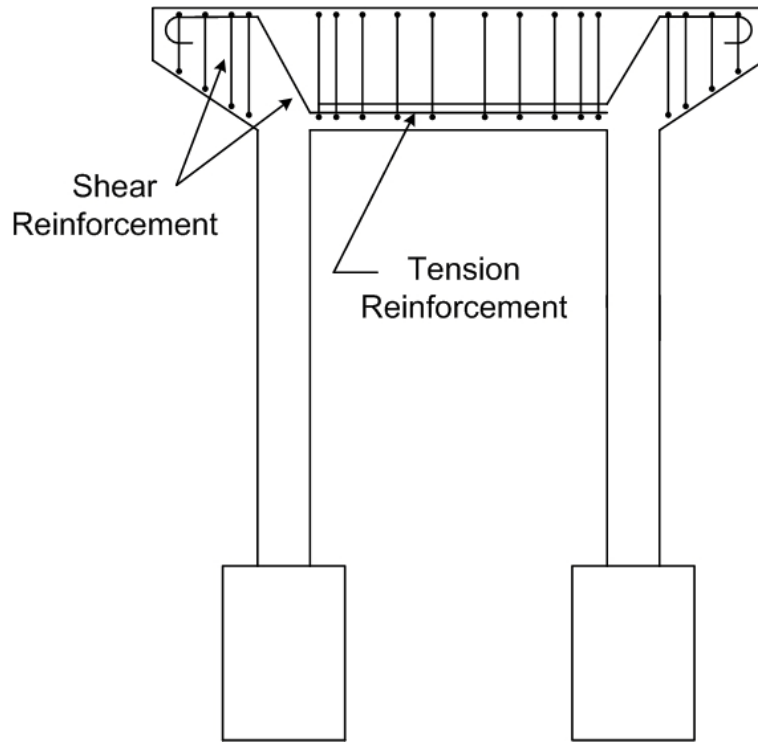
Spandrel Bent Cap Reinforcement
